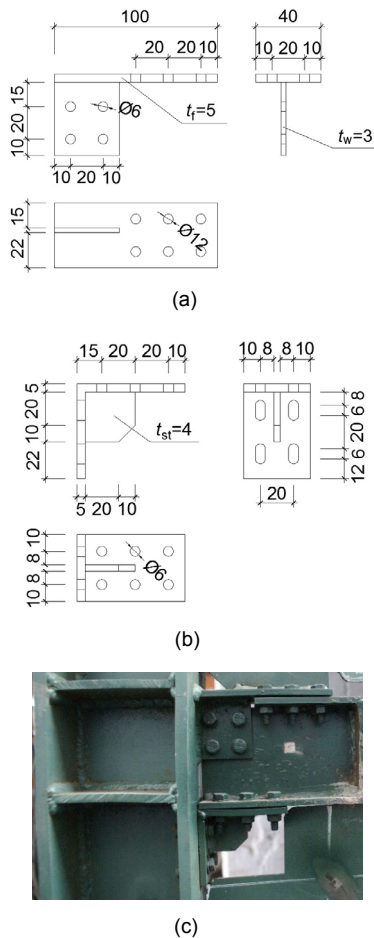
Details of BHA connections (unit: mm) (a) T-shaped connector; (b) L-shaped connector; (c) Assembled BHA connection
